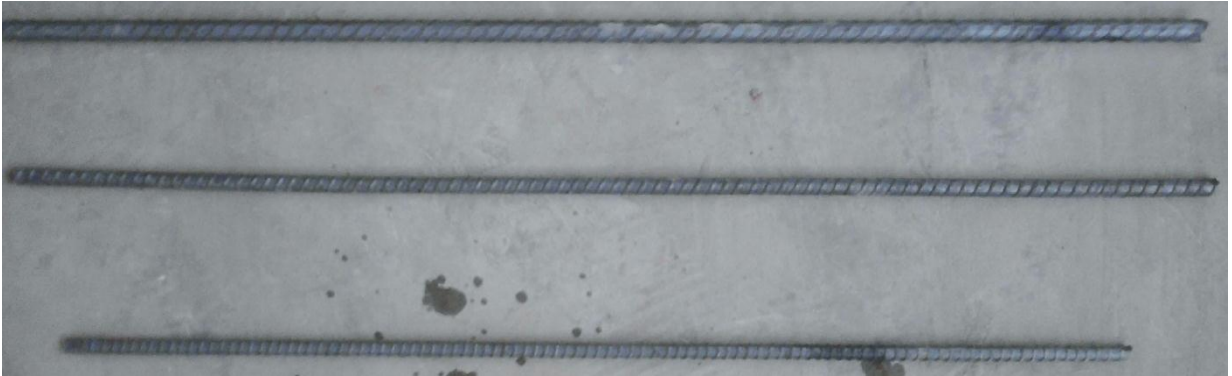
Steel reinforcement bars Used (12mm,10mm &8mm)
